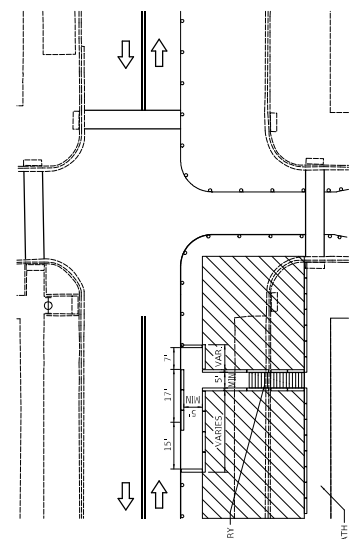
PEDESTRIAN ACCESS THROUGH WORK ZONE - SUB-STAGE 1
